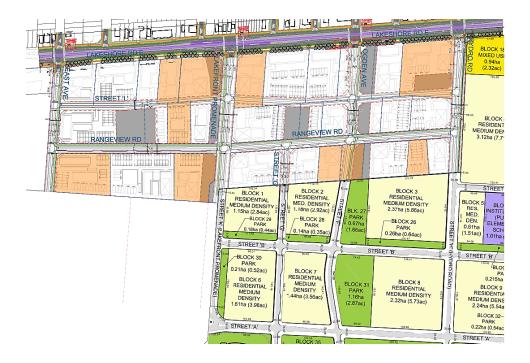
PLANNED RANGEVIEW ROAD NETWORK CONNECTING TO LAKEVIEW VILLAGE ROAD NETWORK
